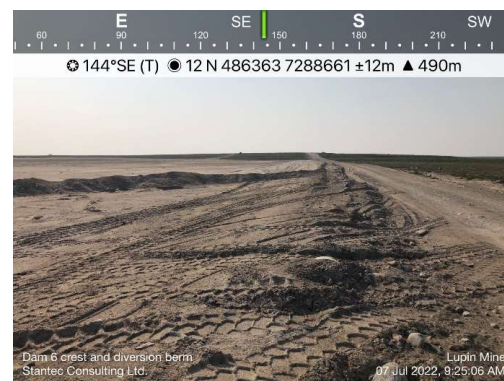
Looking southeast at the crest and diversion berm of Dam 6.
